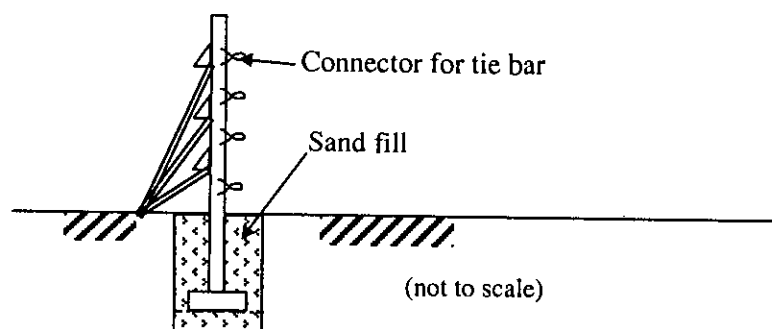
Step 3; Installation of props before commencement of construction of roadway.
